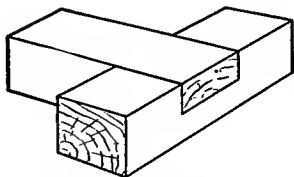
Perspective Drawing of Half Lap Tee Joint
